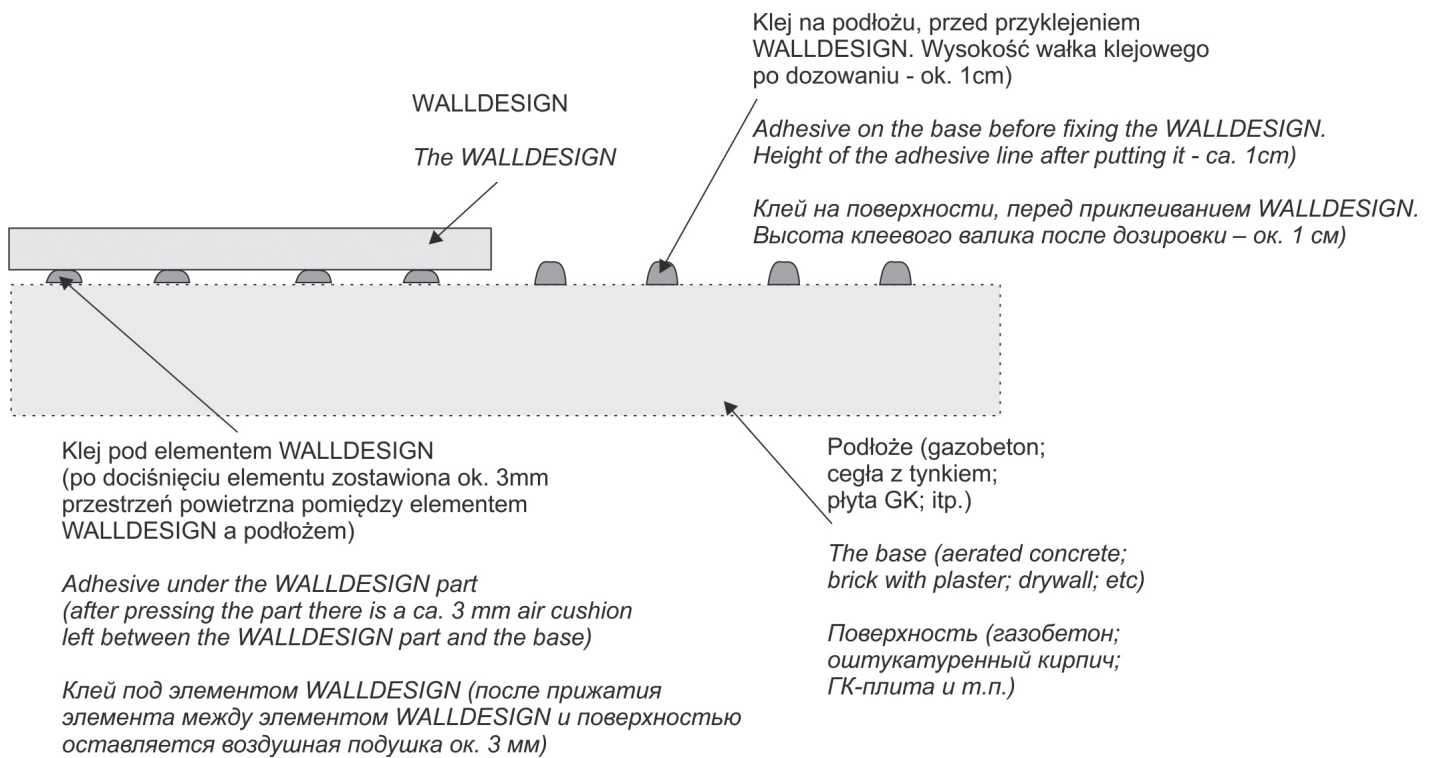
Distribution of adhesive strips - horizontal assembly.
